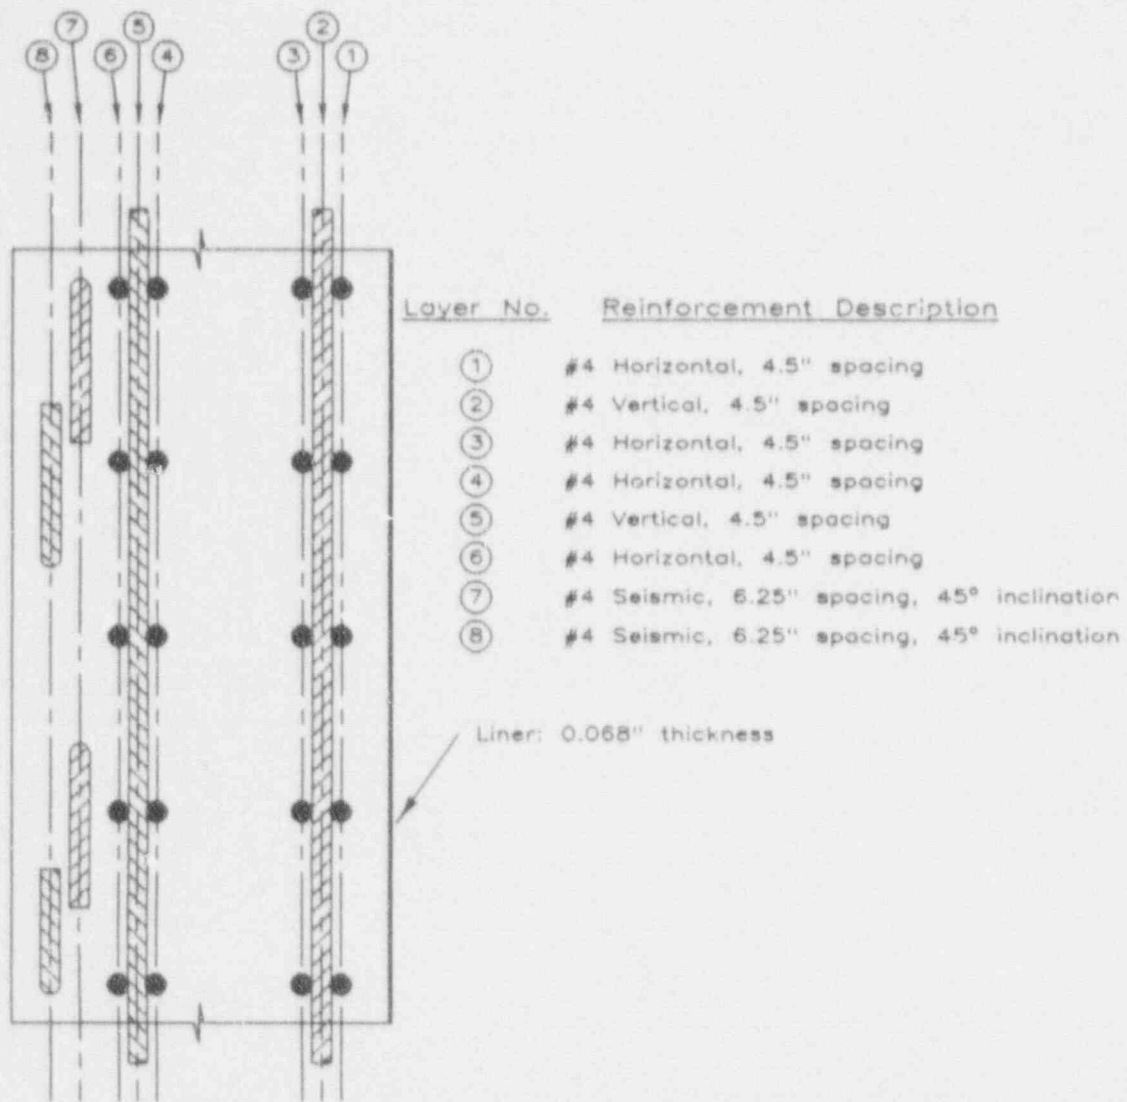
Cylinder Wall Elevation with Typical Reinforcement Distribution
